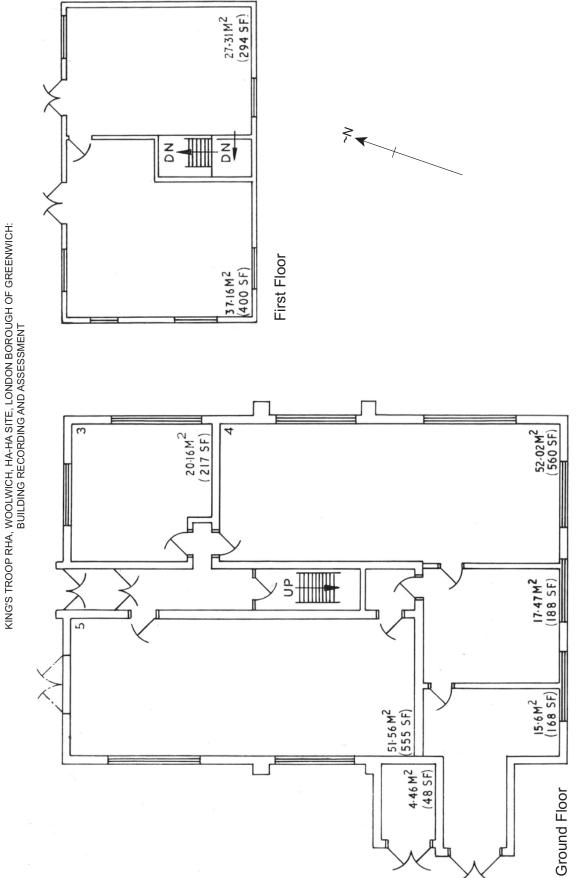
Building 10/10 Ground Floor and First Floor Plans
